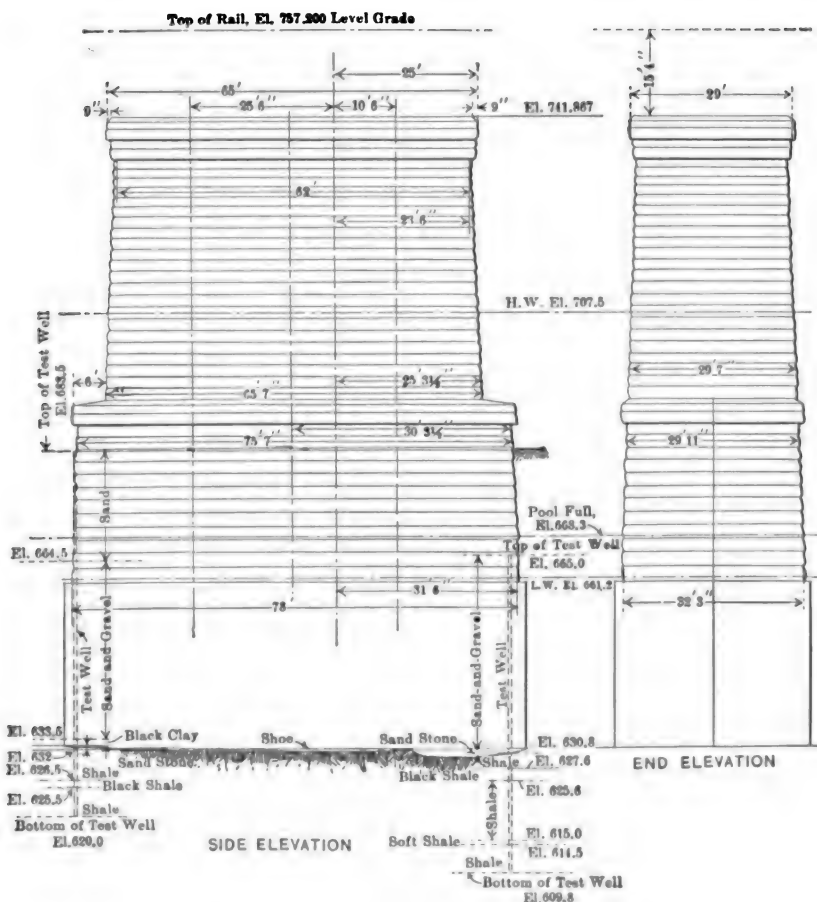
SOUTH CHANNEL PIER OF BEAVER BRIDGE.
